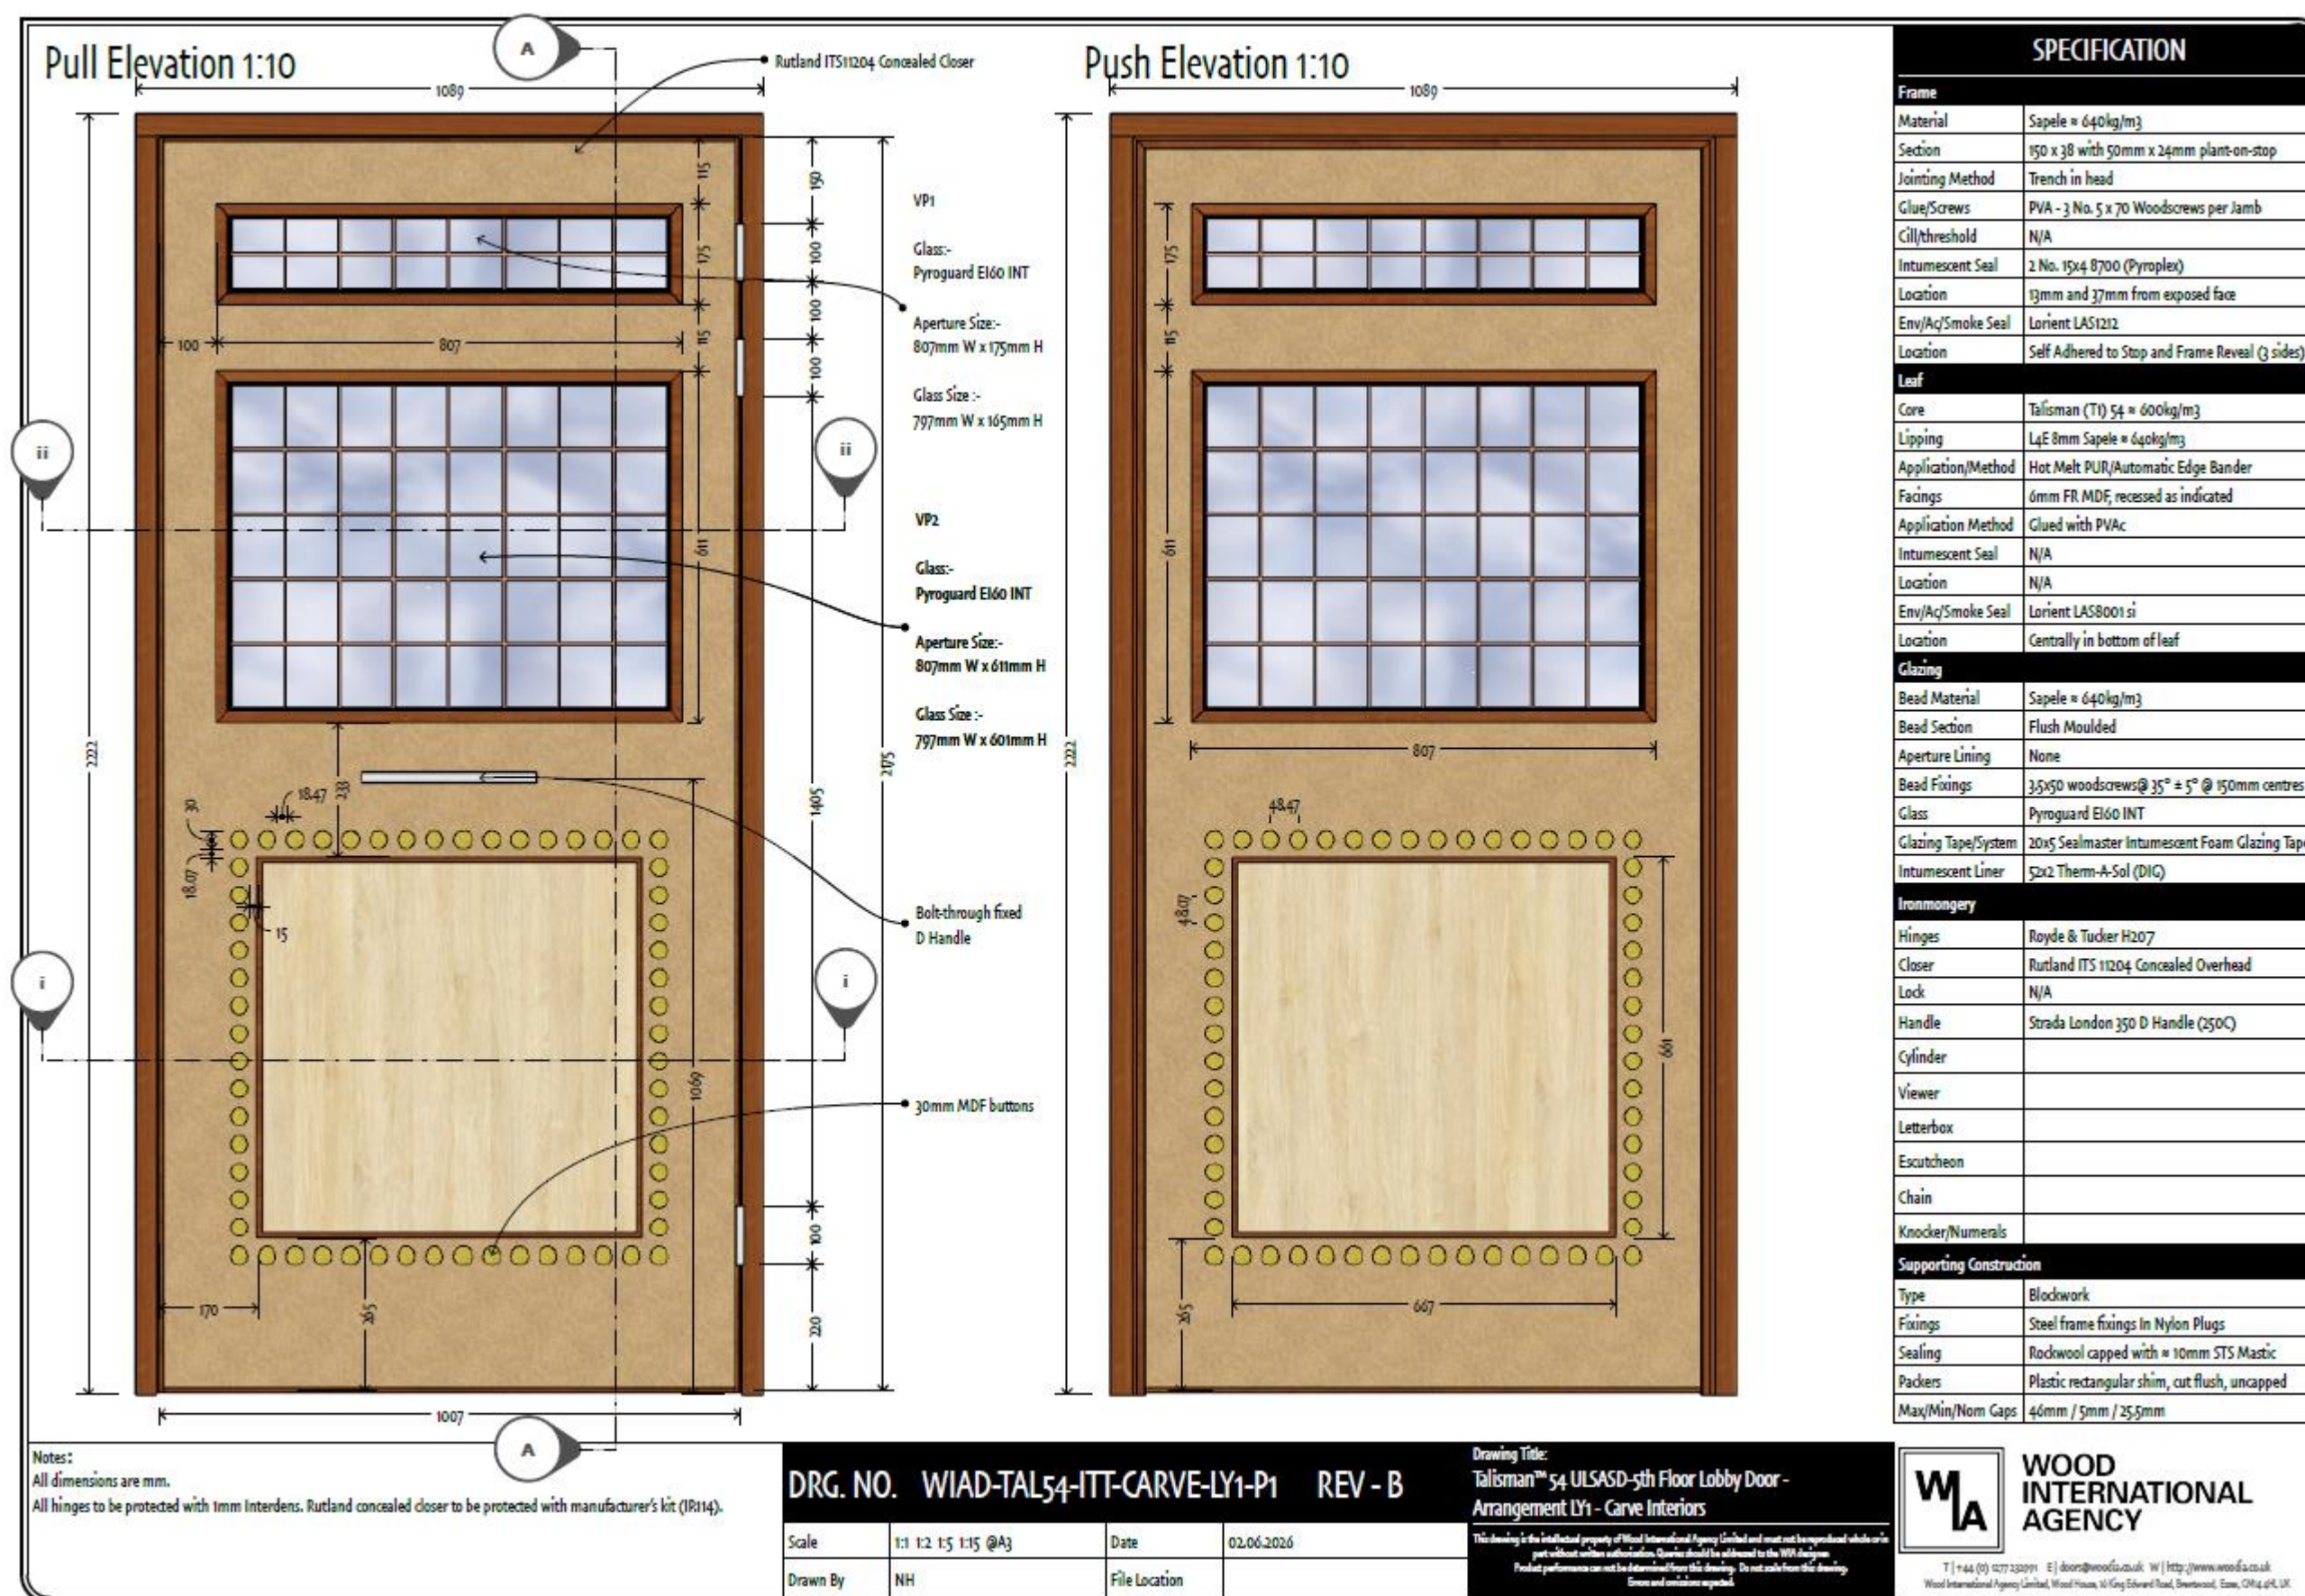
Doorset A - Drawing No. WIAD-TAL54-ITT-CARVE-LY1-P1 Page 1
